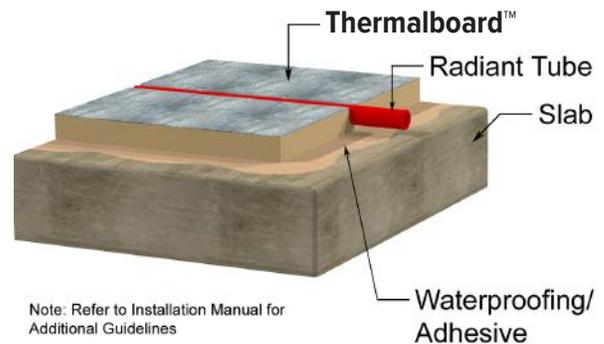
Thermalboard EPS™ installed over concrete subfloor
